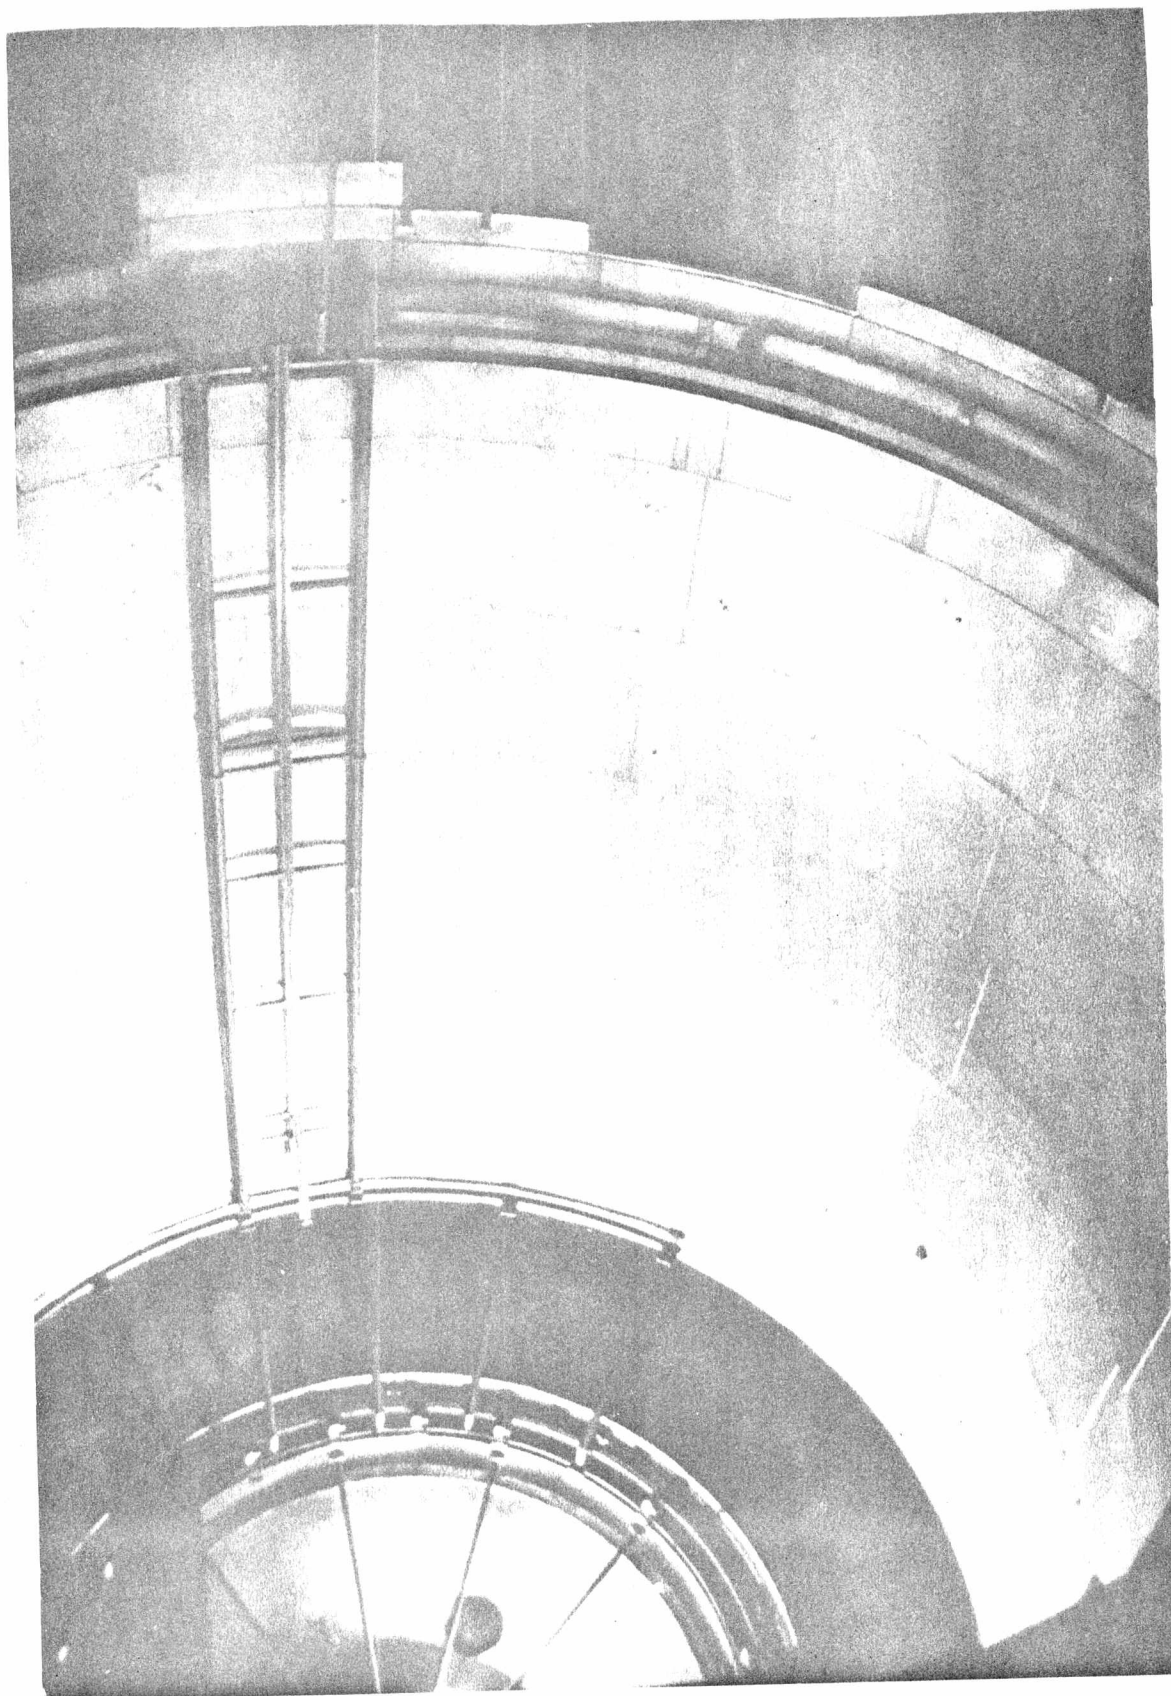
View of the permanent rotative assembly in the Vessel Pit .-
